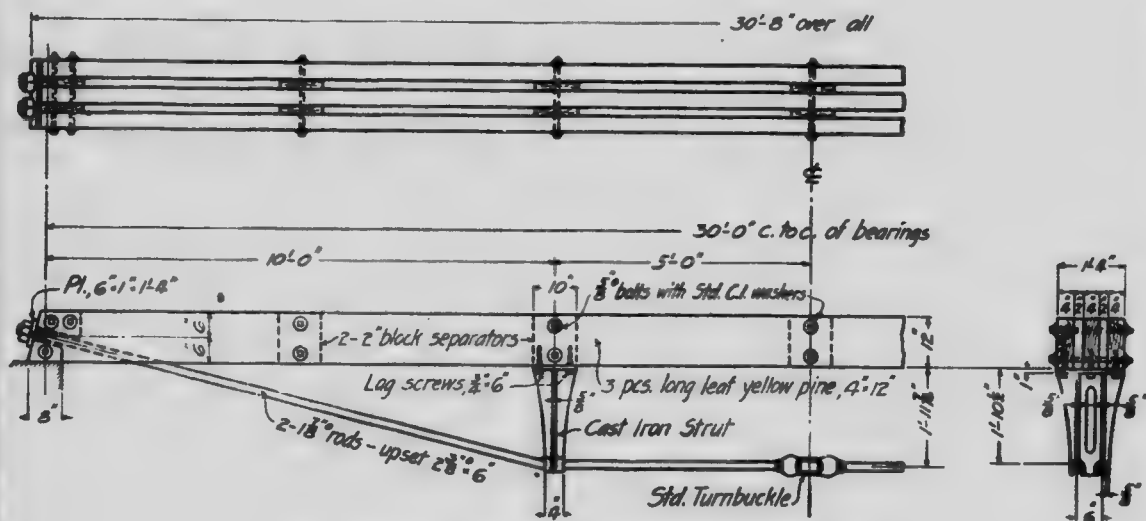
DETAIL OF 30-FT. QUEEN-POST TRUSSED BEAM
